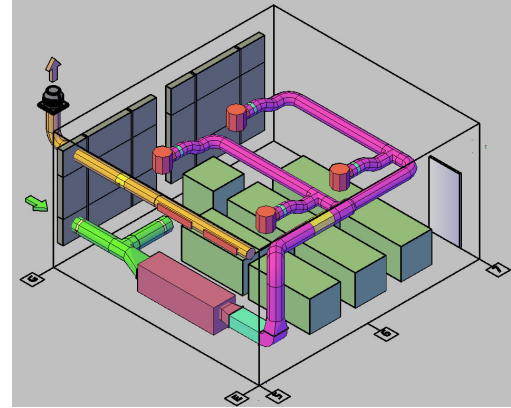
3D view of the ventilation system for the laboratory (exhaust and supply)
